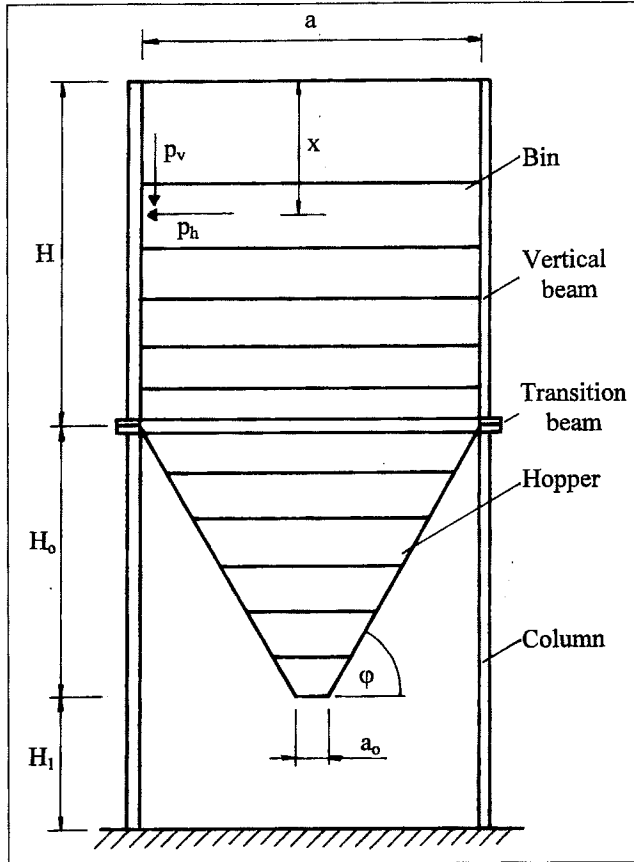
Main structural parts of a welded square bunker and the pressure components.
